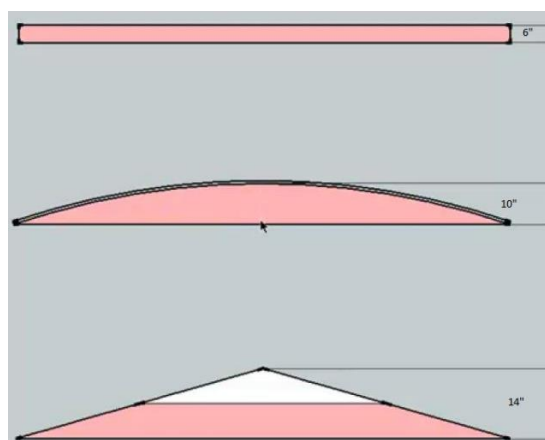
Section drawings of manufactured home roof configurations (from top to bottom: flat roof, bowstring roof, pitched roof).
